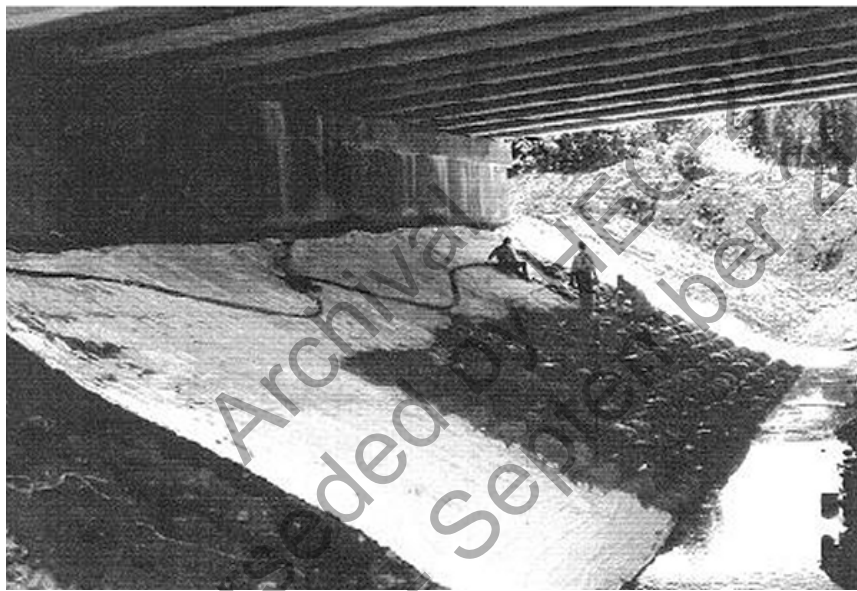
Installation of articulating grout filled mat proceeding upslope (ODOT).⁽⁶⁾
